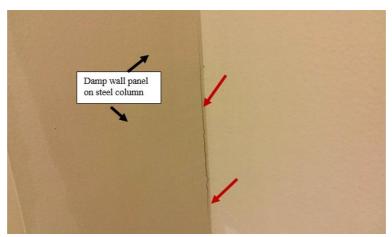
A darker tinted damp region was observed to be in close proximity to the main steel column. Crack propagation occurred along the length of the column wall at the corner to the adjacent wall (red arrows)
